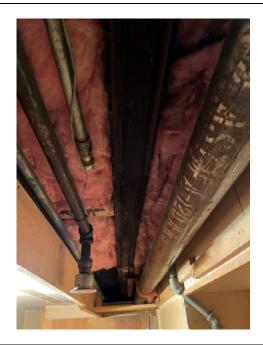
Fire damage to the main floor joist as seen from the north end of the basement at 215 W. Lincolnway.
